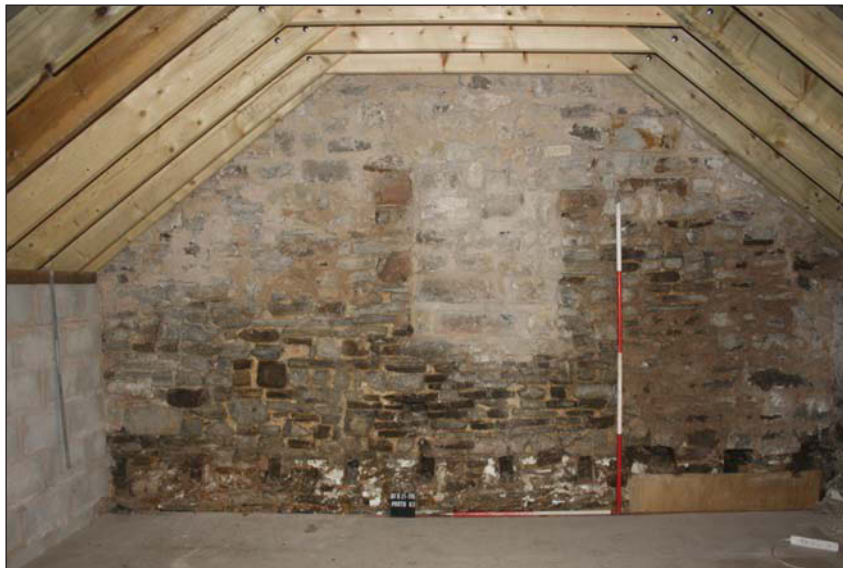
First floor blocked pitching eye and former floor joists, looking north, scales 2m and 1m.
